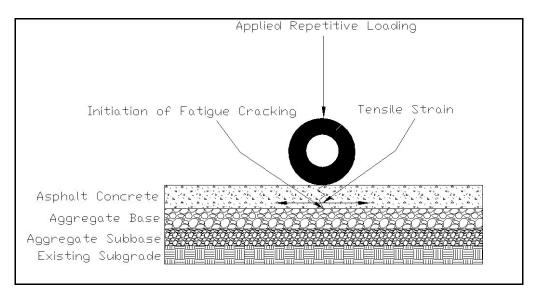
Fatigue Cracking in HMA Pavements
